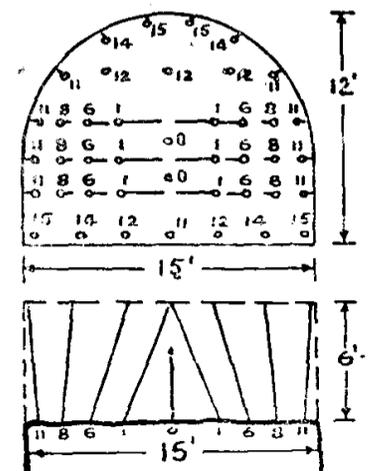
Milli-second Delay Blasting with Wedge Cut.
